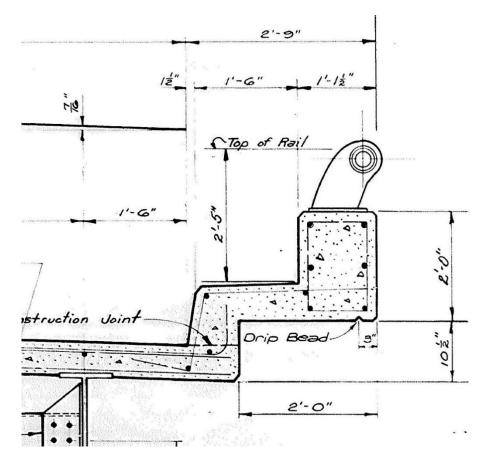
Details from drawing SCJ5C-90-24P concrete post and beam
